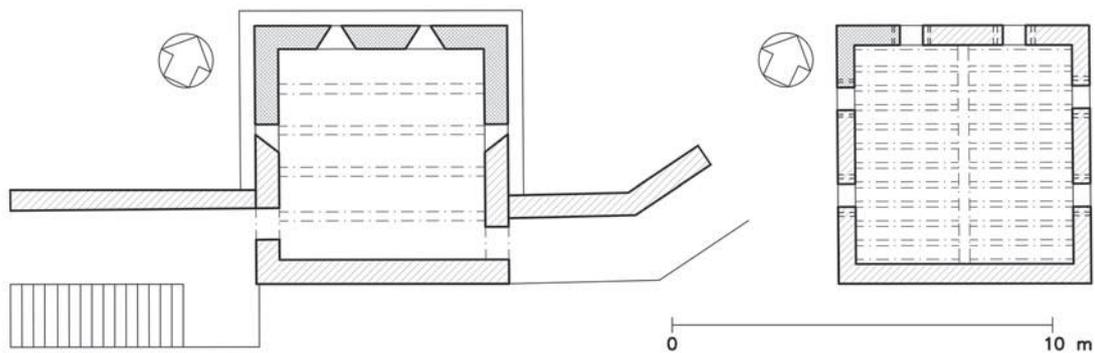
Messene. Tower 45, layout of 1st floor (left) and 2nd floor (right)
